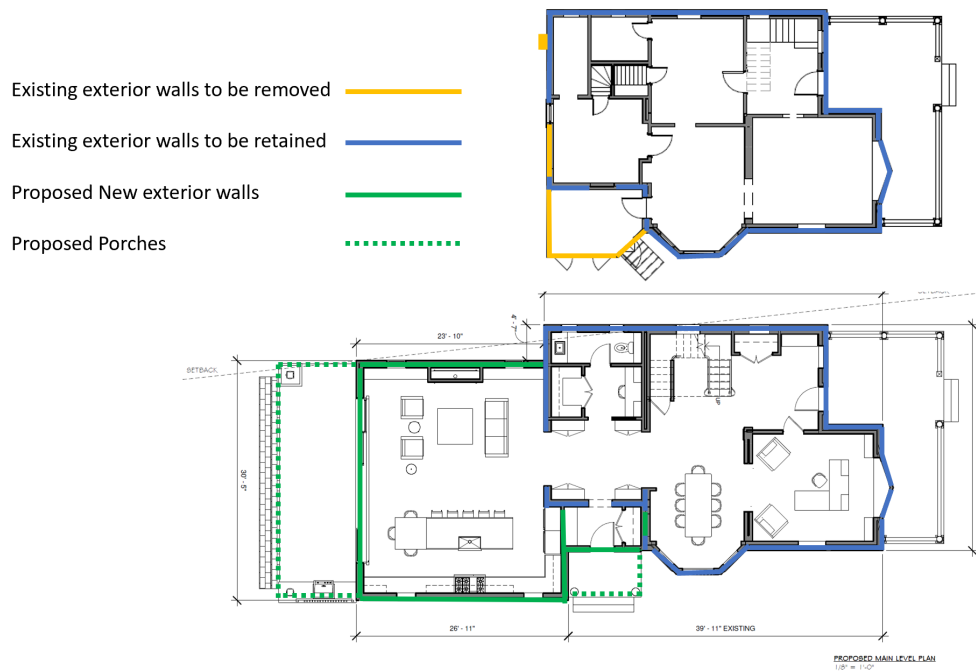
936 Mapleton Ave., Existing and proposed First Floor plan
